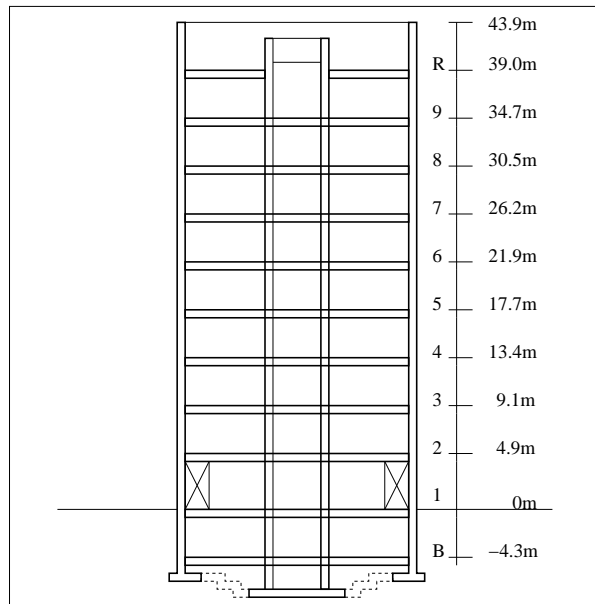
Millikan Library — North-South Section. Walkway openings on the ground floor, which cut through the shear walls, are represented by crosses.
